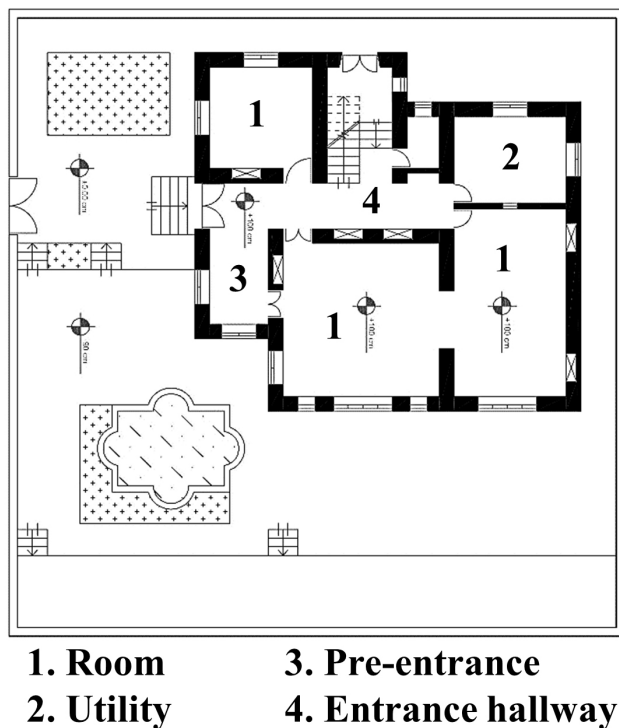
Ground floor plan of the House No. 3. Source: Authors.
